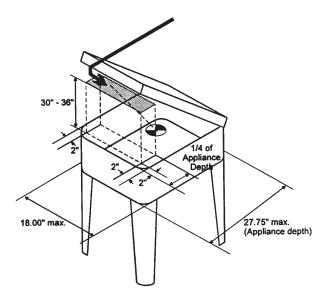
Model NL-F2 Nozzle Placement, Tilting Skillet/Braising Pan.
